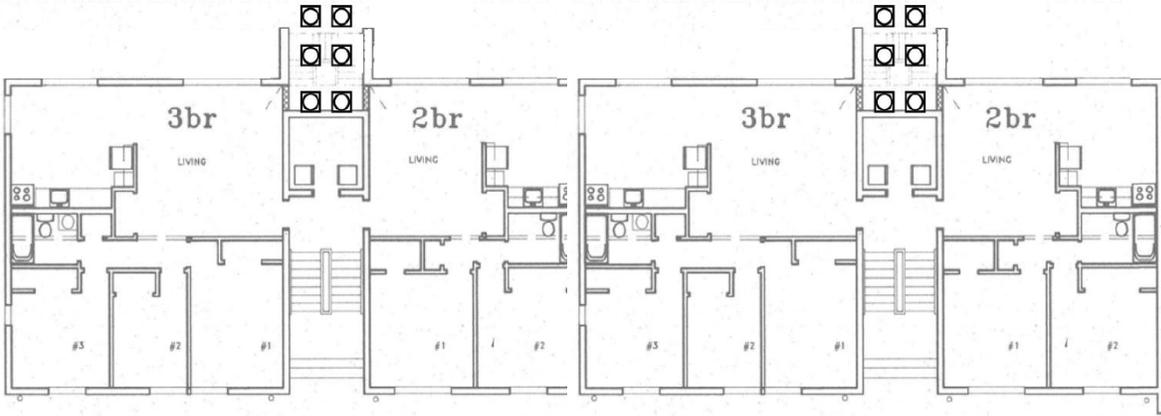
Floor plans for three-bedroom and two-bedroom apartments (same on all three floors)
